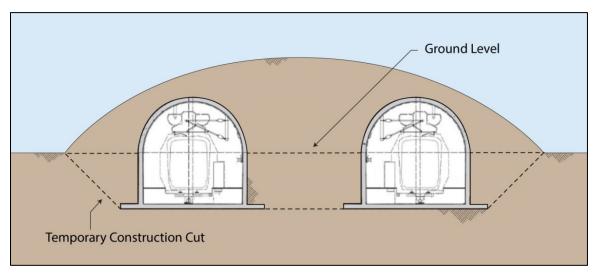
Typical High-Speed Rail At-Grade Covered Tunnel Cross Section
